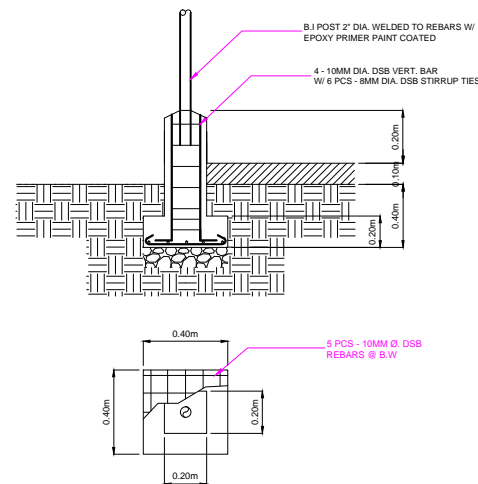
DETAIL "A" TYPICAL COVERED WALK SECTION DETAILS
